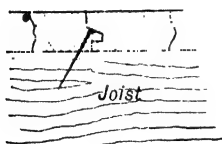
Rebated, Grooved, and Tongued Flooring.
